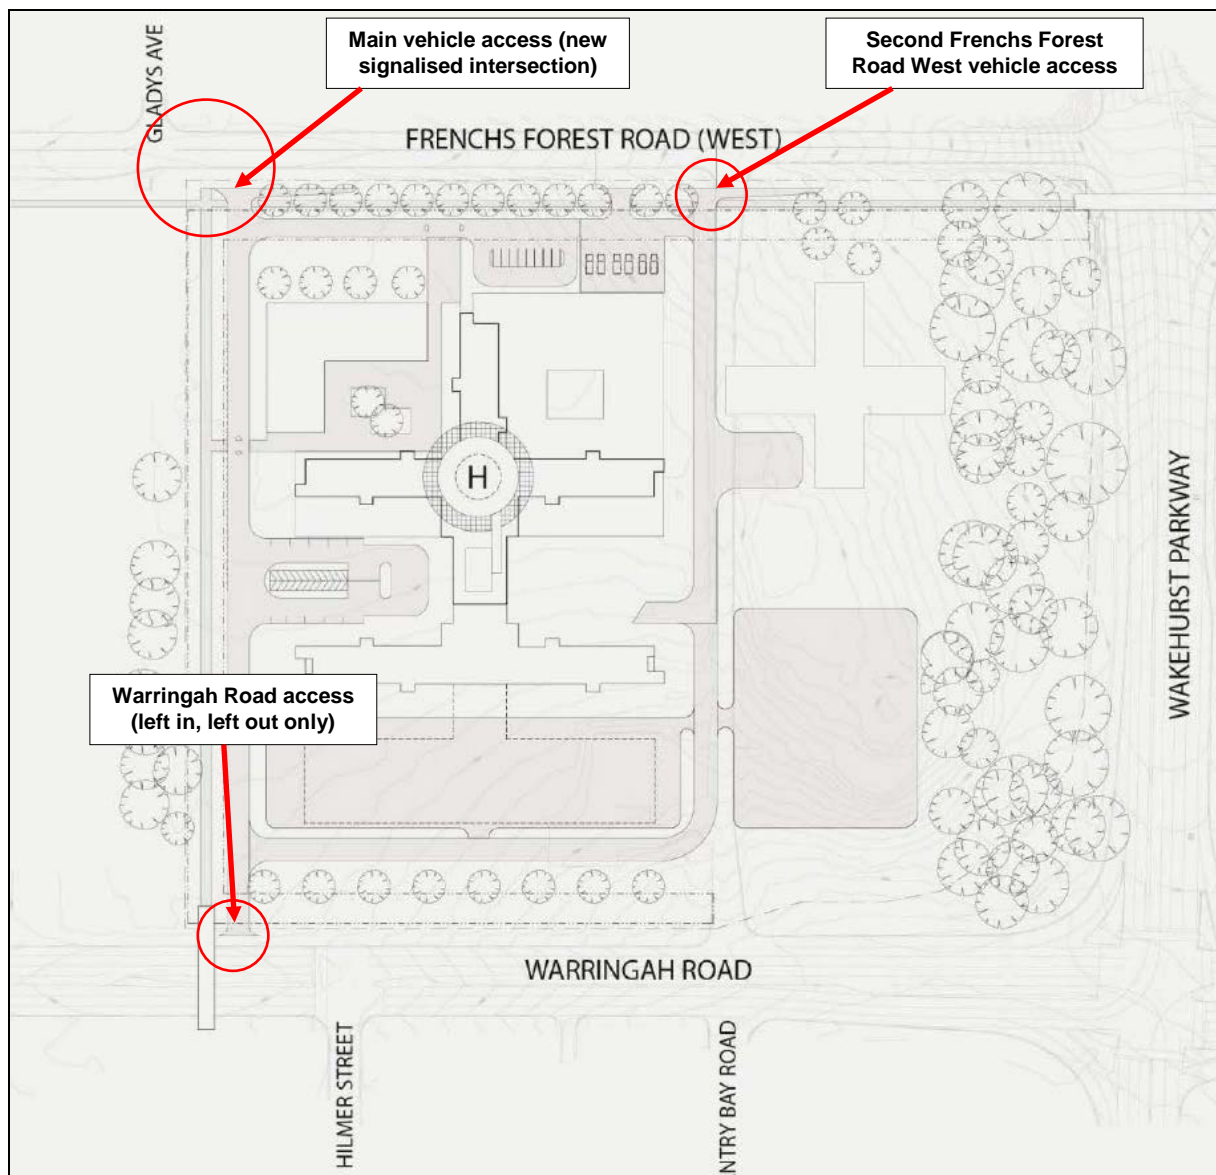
Indicative Proposed Site Vehicle Access Arrangements (Note: Indicative Site Layout)
